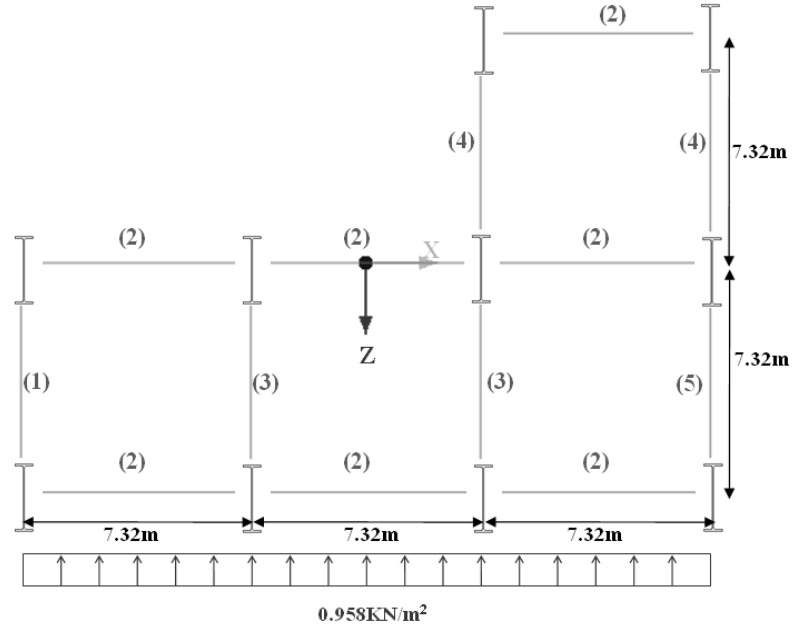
Plan view of the twenty-story, irregular steel frame
